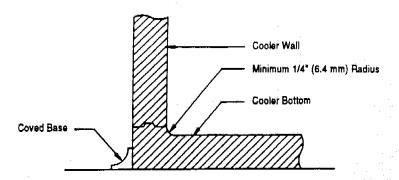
Installation of Floorless Walk-in on Existing Floor
